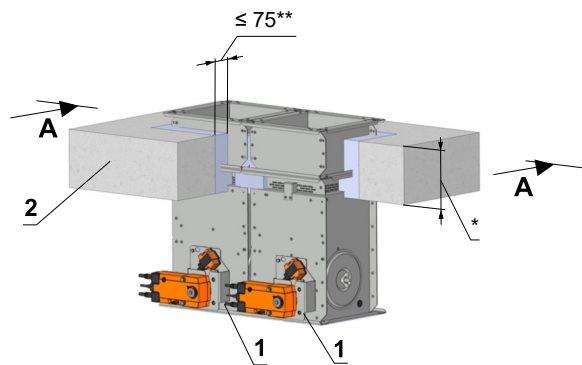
Solid ceiling construction - battery - mortar or gypsum
